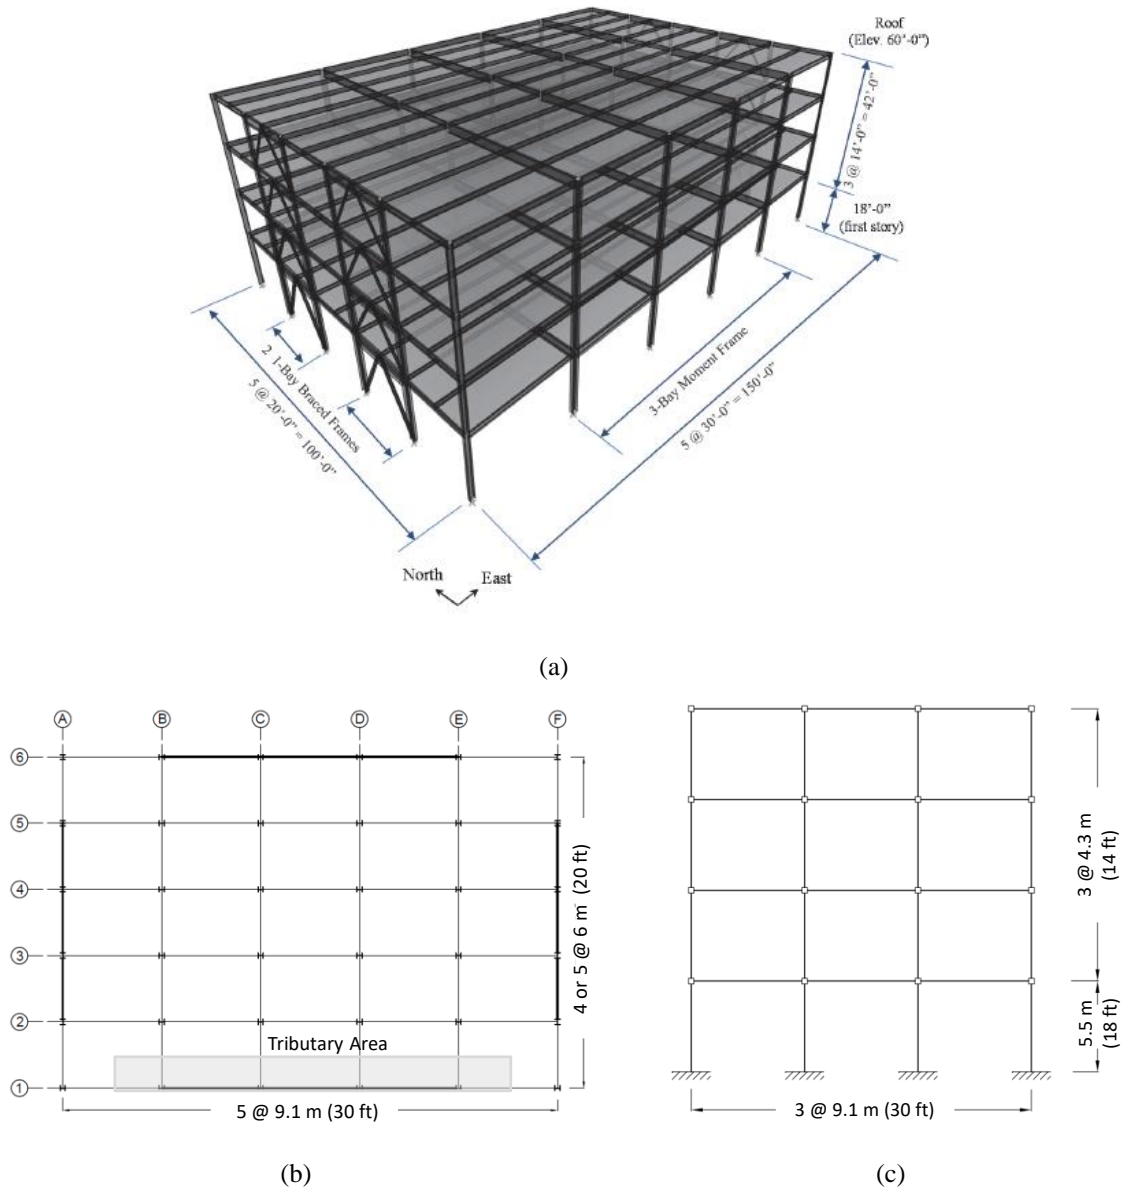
4-story Steel Moment Frame: (a) Isometric View of MC4 Prototype Building, (b) Plan View, (c) Elevation View
